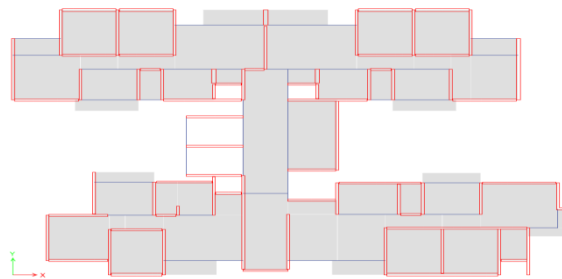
ETABS VIEW OF THE FLOOR PLAN OF THE BUILDING
